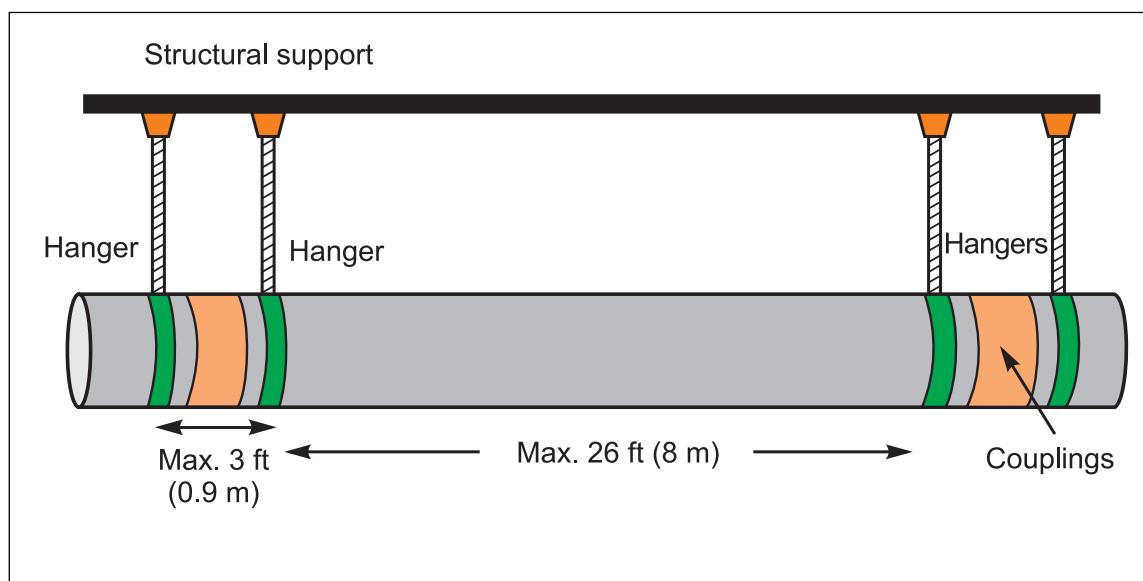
Piping arrangement for maximum horizontal distance of 26 ft (8 m) between pipe hangers
